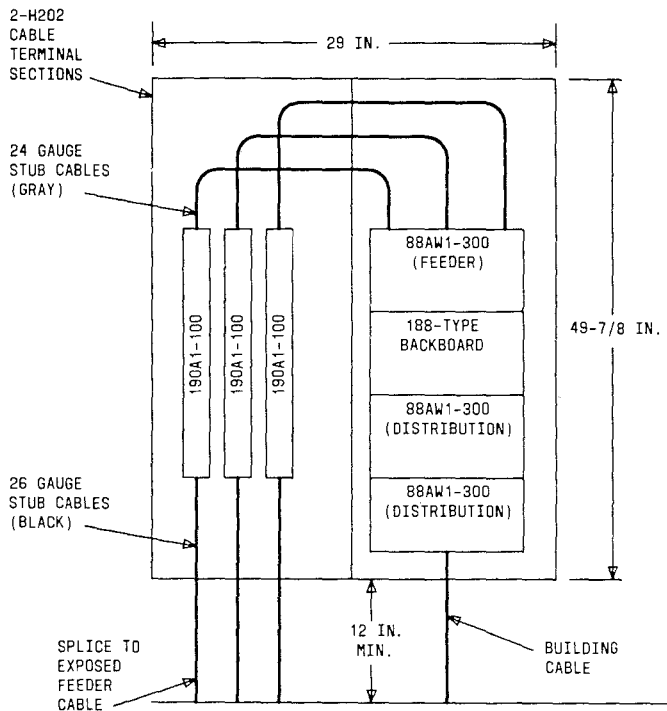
300-Pair Exposed Entrance Cable—88-Type Connecting Blocks
